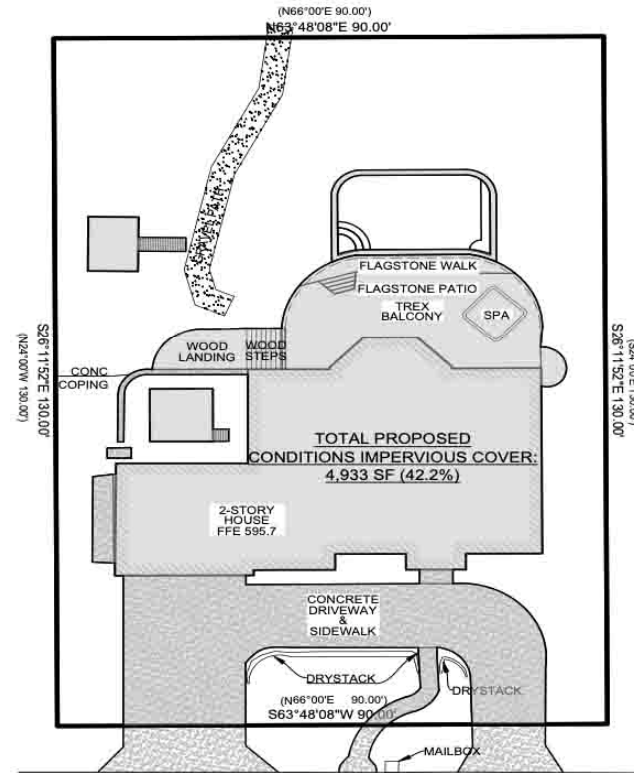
EXHIBIT DETAILING TOTAL EXISTING & PROPOSED IMPERVIOUS COVER
